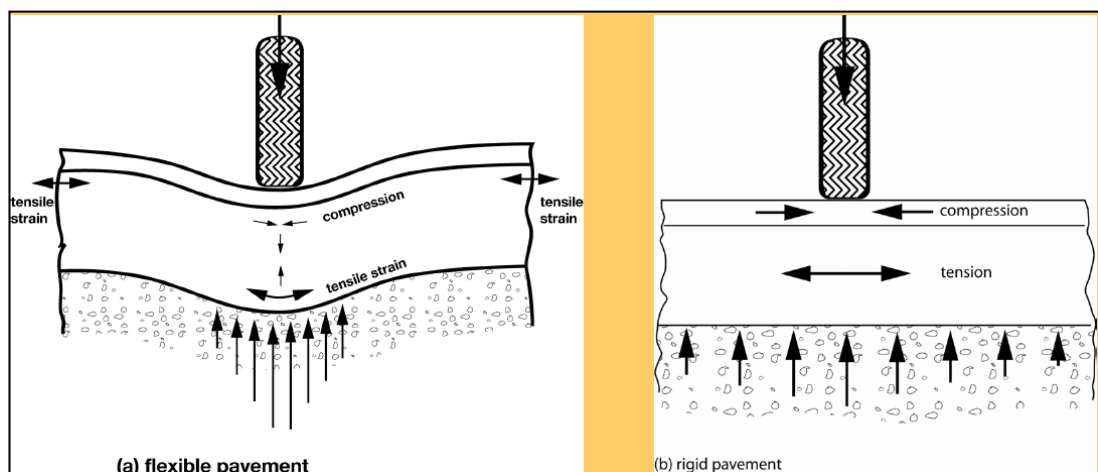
Loading behaviour of pavement (Austroads 2005)
